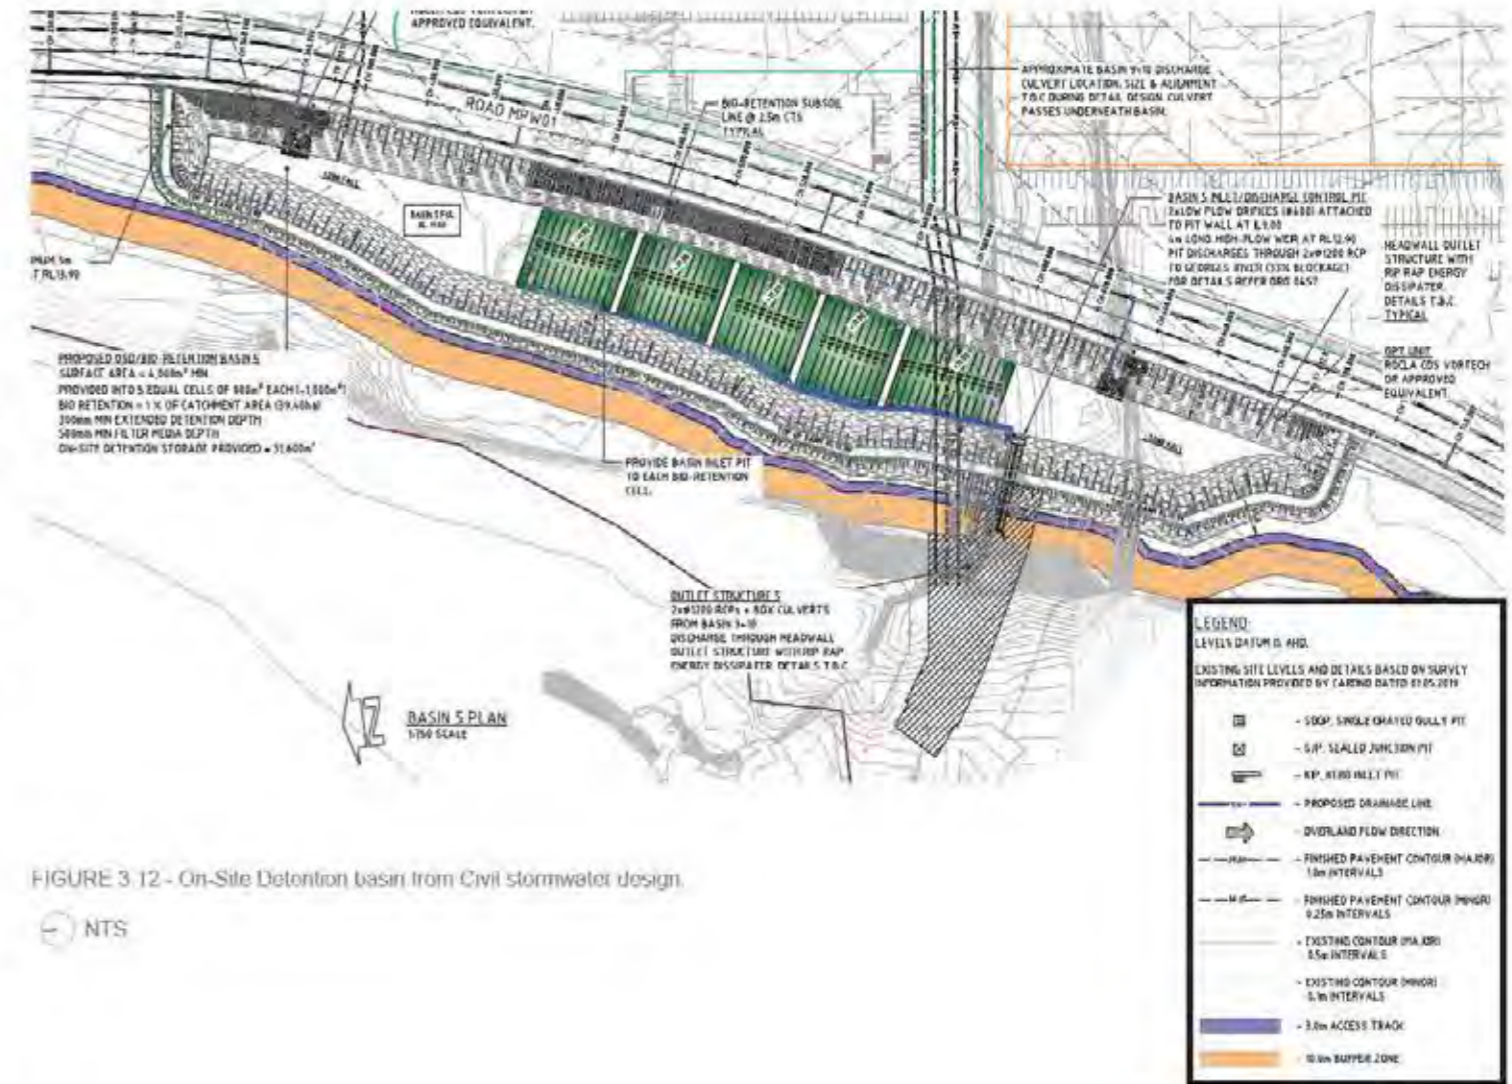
On-Site Detention basin from Civil stormwater design.
